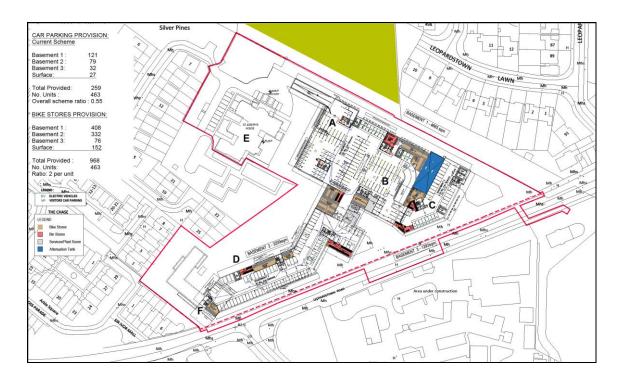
Proposed Basement Level Layout (Source: O'Mahony Pike Architects)
